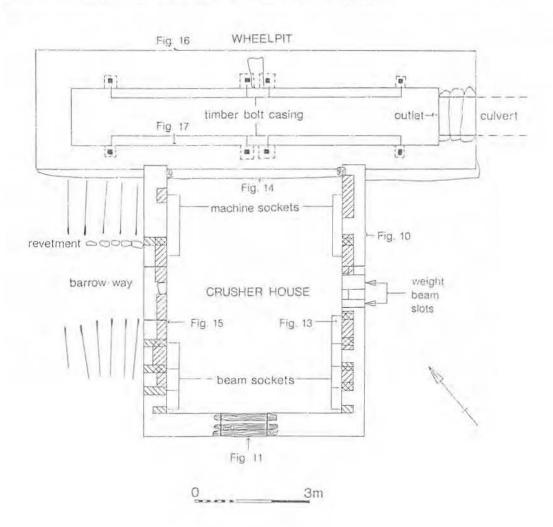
Crusher house and wheelpit - plan and location of elevations.
